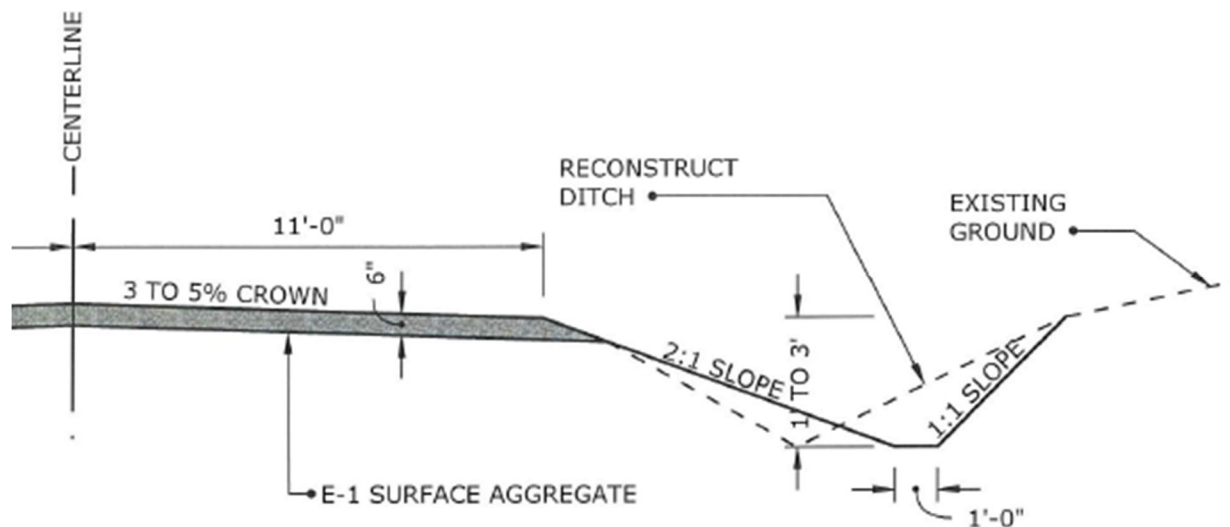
Source - Plan Sheet C02 Typical Section for Haines Borough Porcupine Trail Road, Phase I project.
